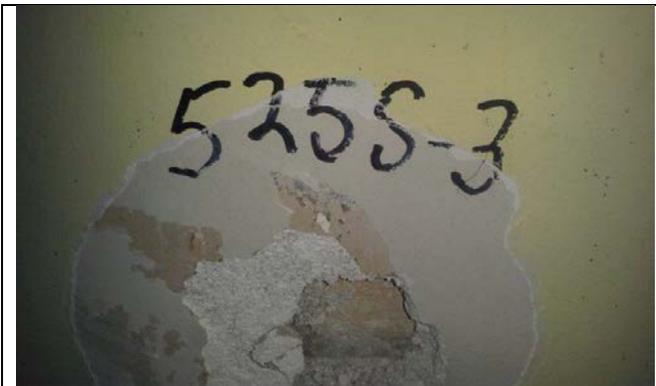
Plaster (525S-3) Utility Room, Wall B.
